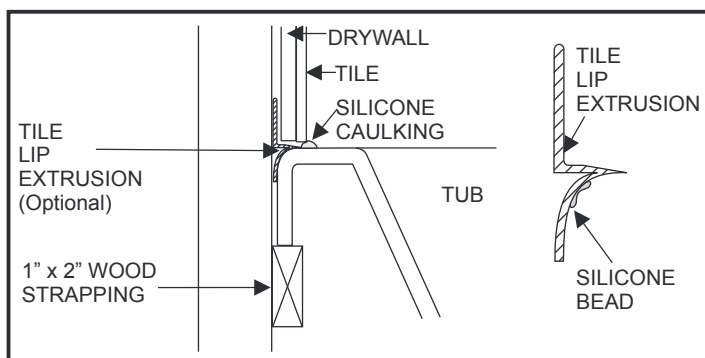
DROP-IN TUB IN ALCOVE INSTALLATION. WOOD STRAPPING, TILE LIP EXTRUSION AND WALL COVERING
